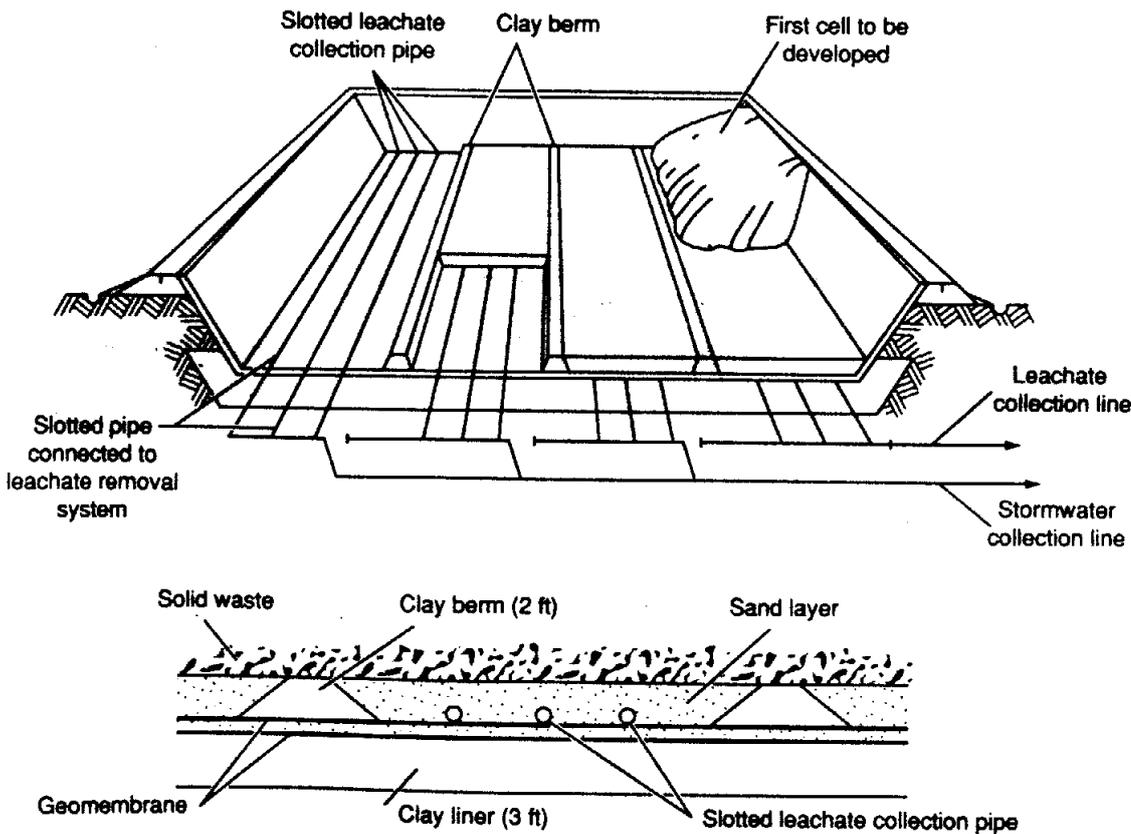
Typical leachate collection system using multiple leachate collection pipes: (a) pictorial view and (b) detail of typical leachate collection pipes (adapted from Ref. 33).
